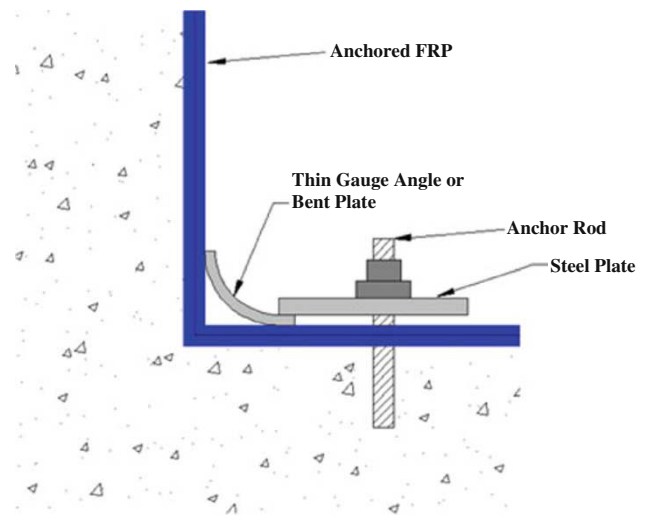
Ductile anchorage system (adapted from Hall et al. 2002).
